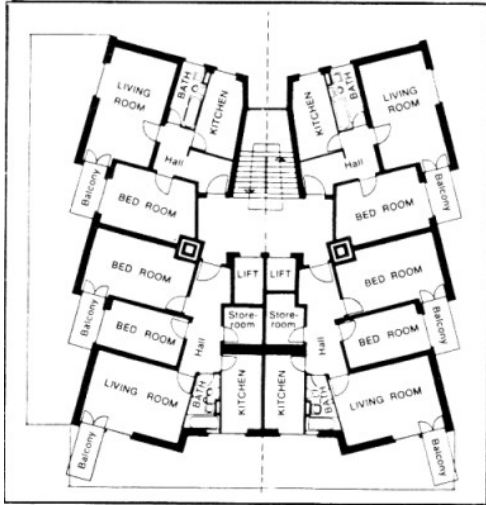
Typical floor layout of 18 storey block of Flats completed in Zurich in 1957, in which the outer load-bearing walls were only 380mm thick.
